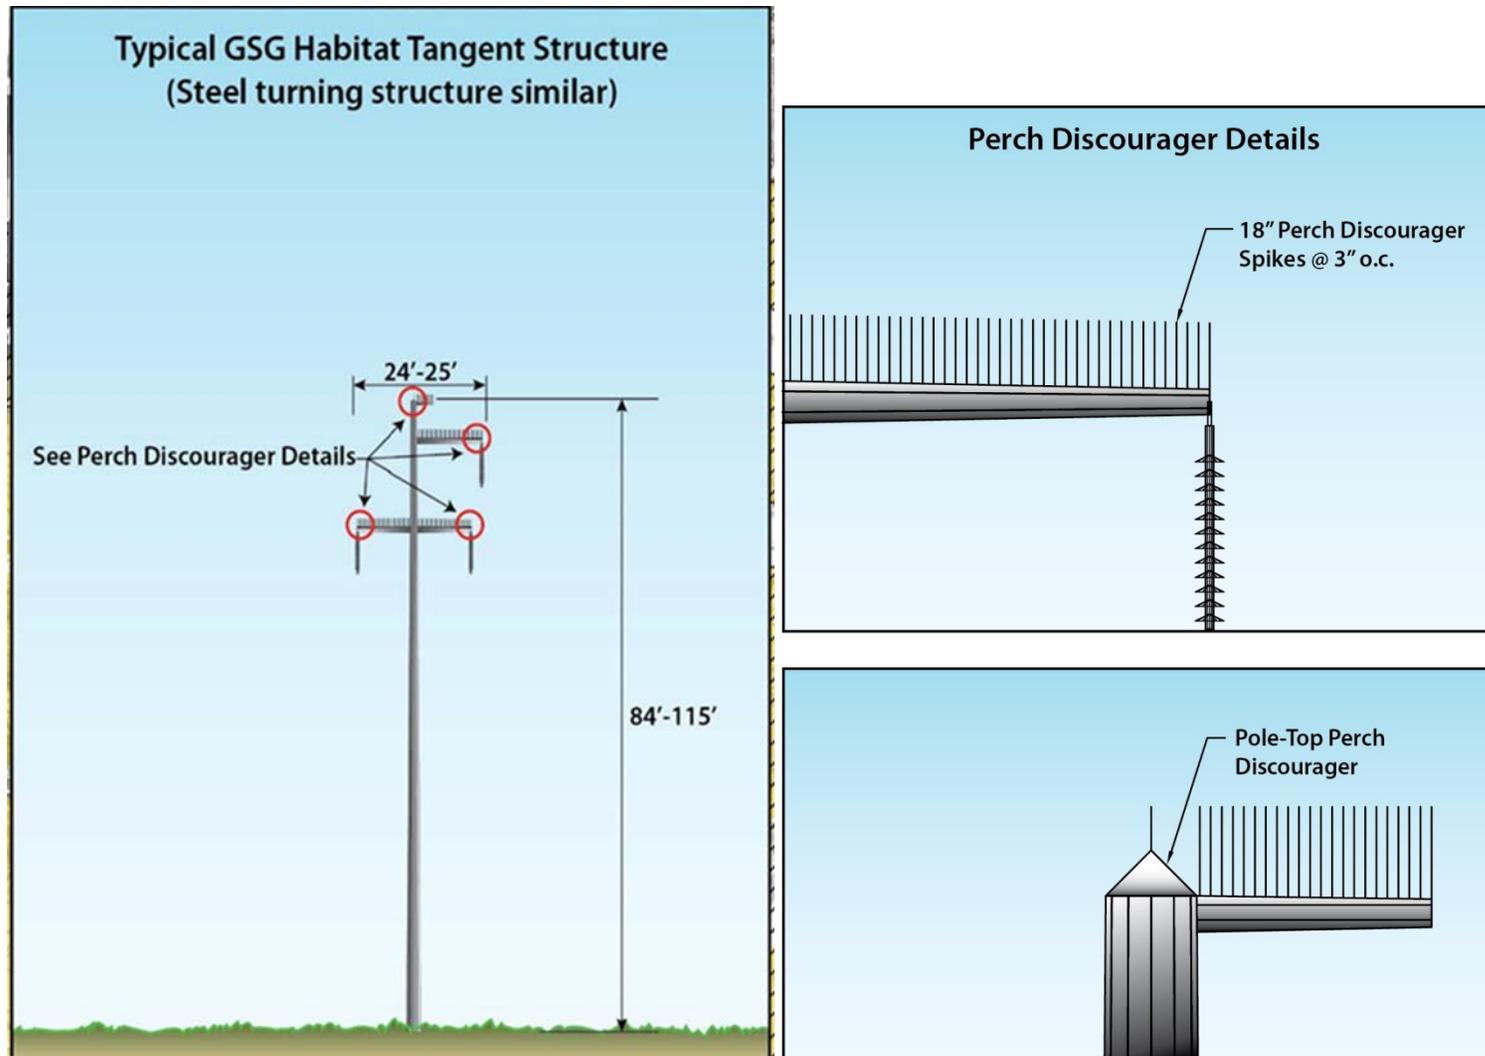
Existing and Proposed Steel Structures and Perch Discouragers in Dry Creek Basin
